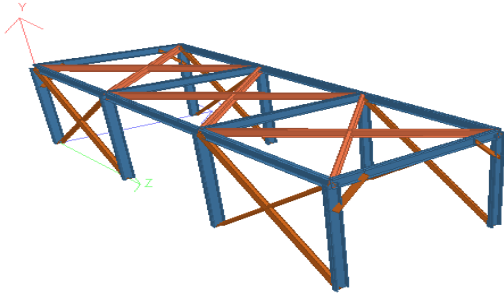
Case I : Single floor structure with diagonal bracings between side span columns
